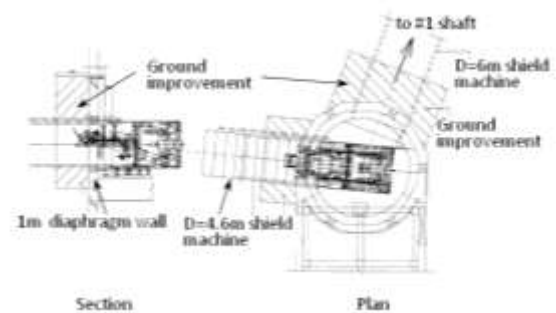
Section and plan layout of #2 shaft and shield machine arriving work
